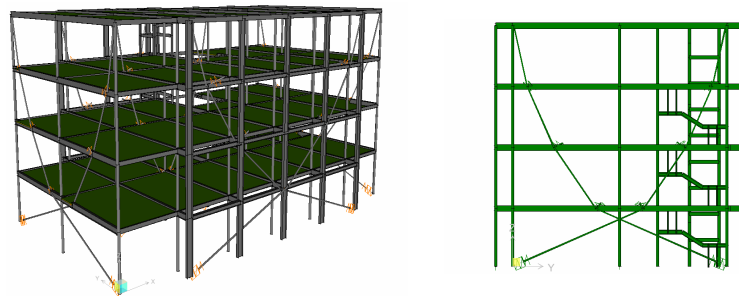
Detailed View and Cross Section of the Finite Element Model of a Four-Story Wing of the DC-Retrofitted Main Building Structure
